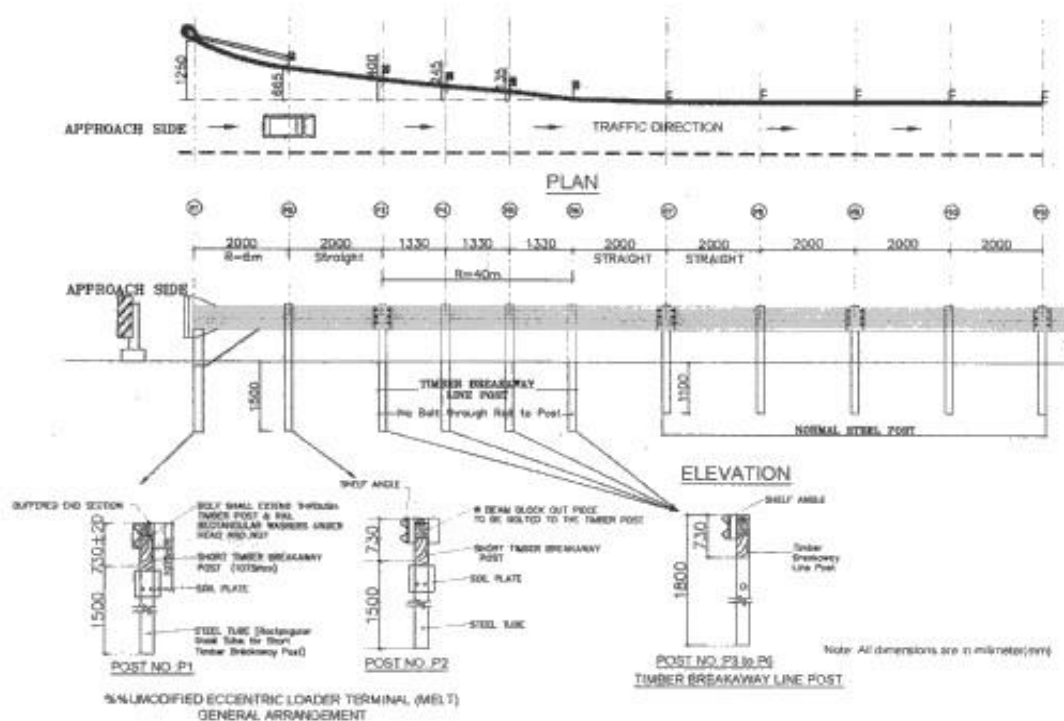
Modified Eccentric Loader Terminal (MELT) Arrangement for Approach Side of the Metal Beam Crash Barrier
